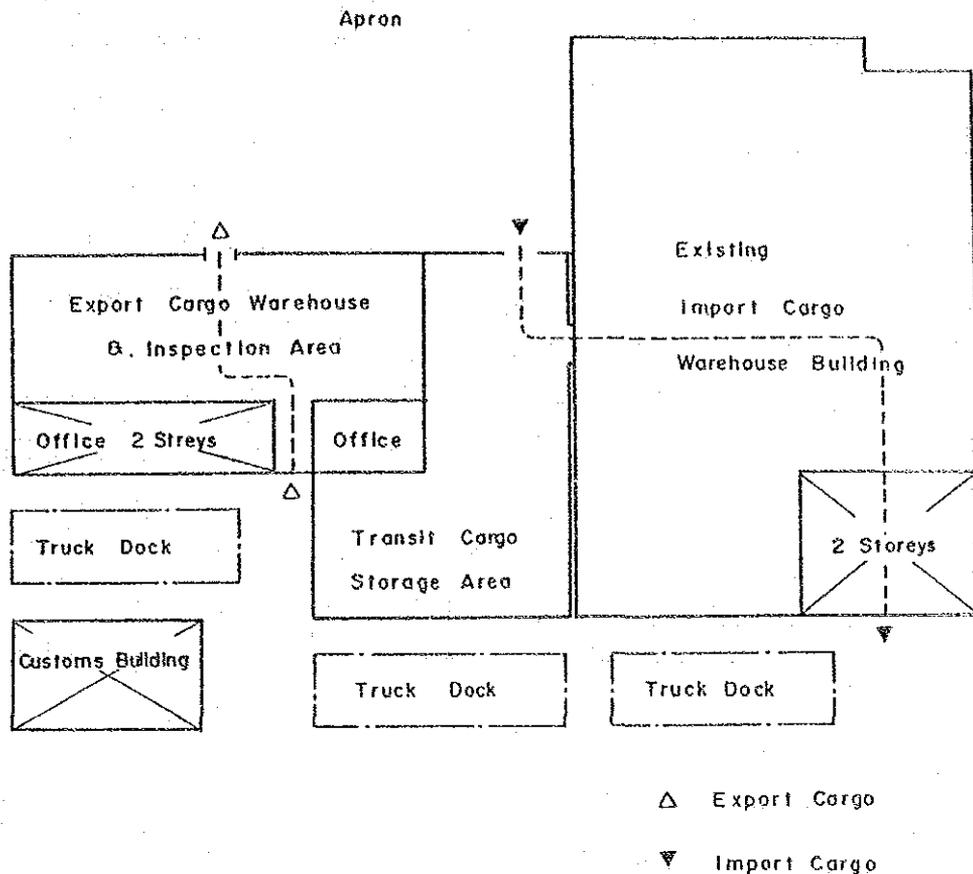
Conceptual Plan of Cargo Terminal Buildings
